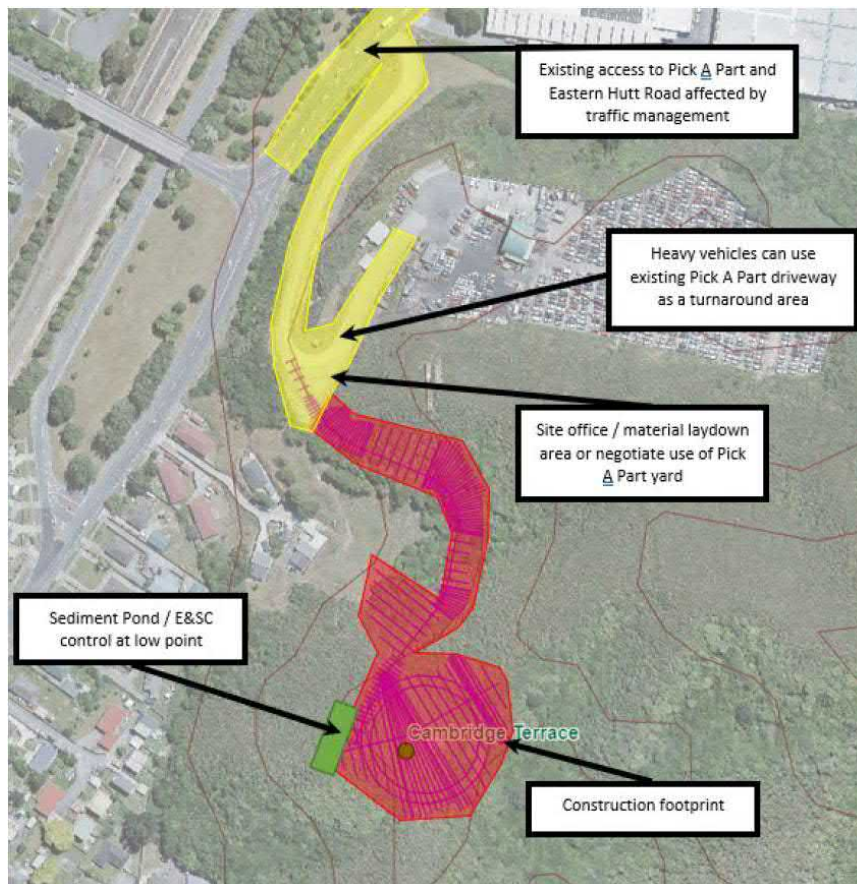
Aerial image showing the anticipated construction footprint at the proposed Cambridge Terrace reservoir site
